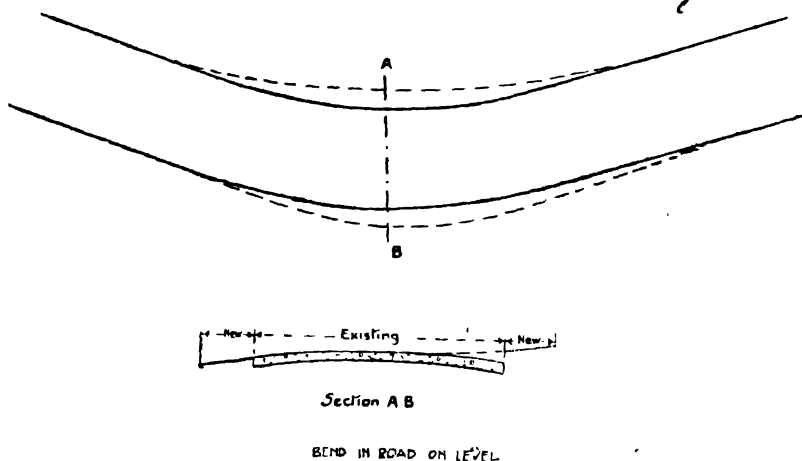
Widening and Superelevating Existing Road at Minimum Cost.
